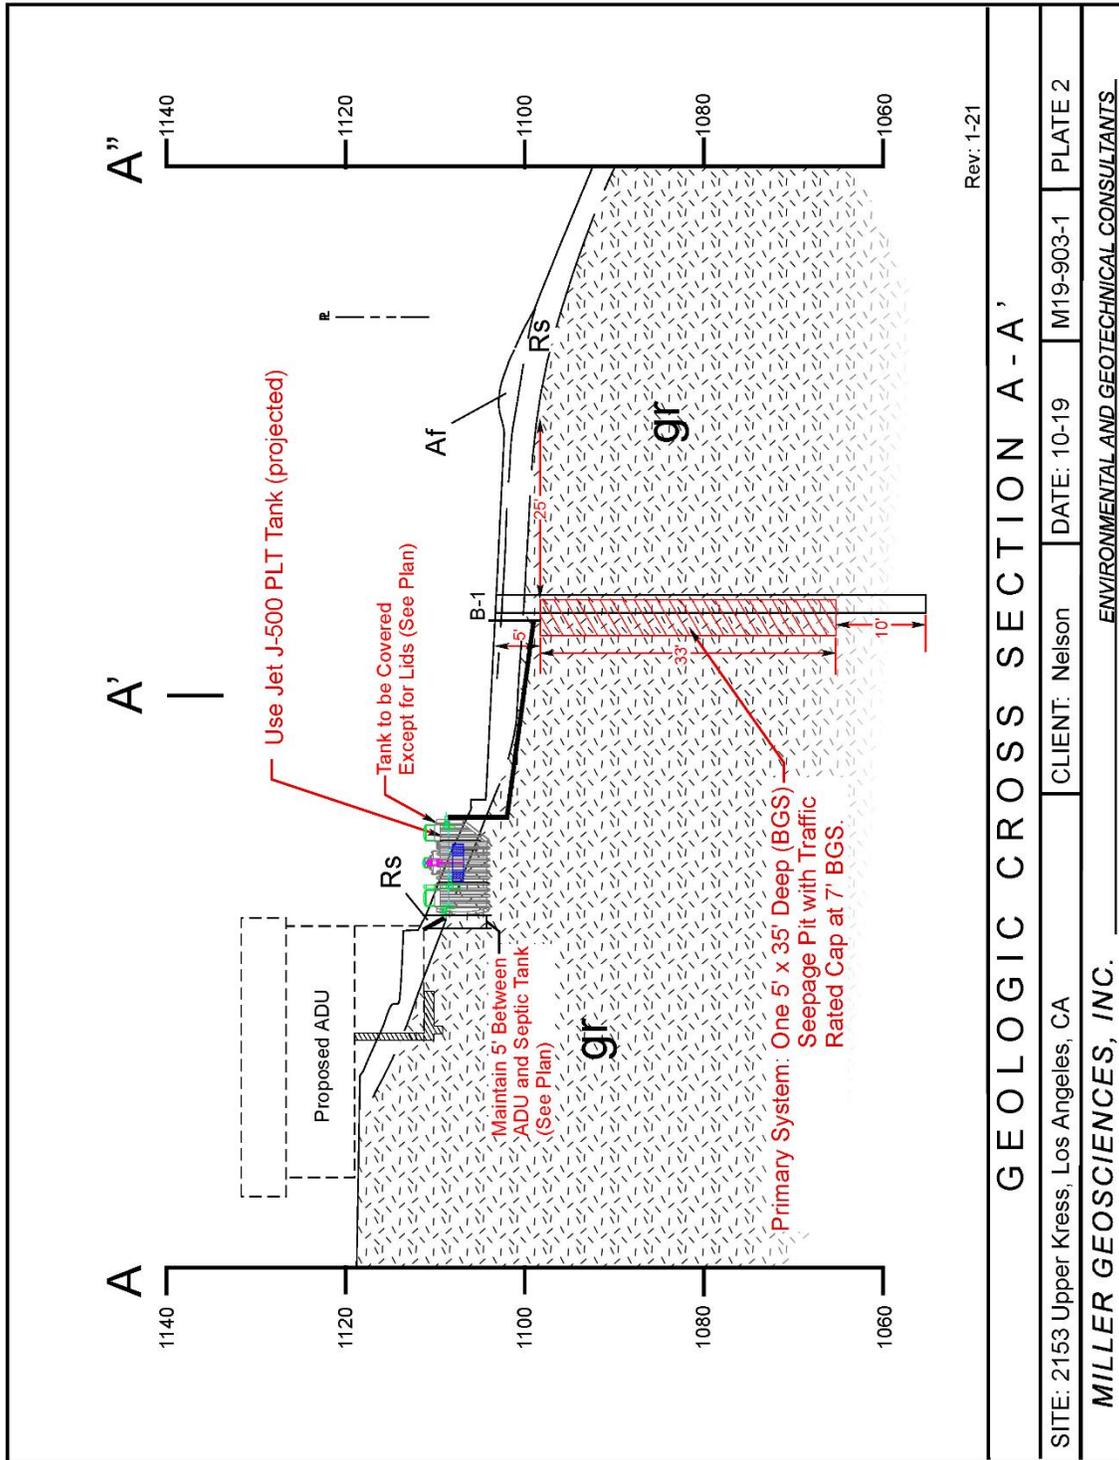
Profile view of site, showing relative elevations of proposed ADU, advanced OWTS, and seepage pit.
